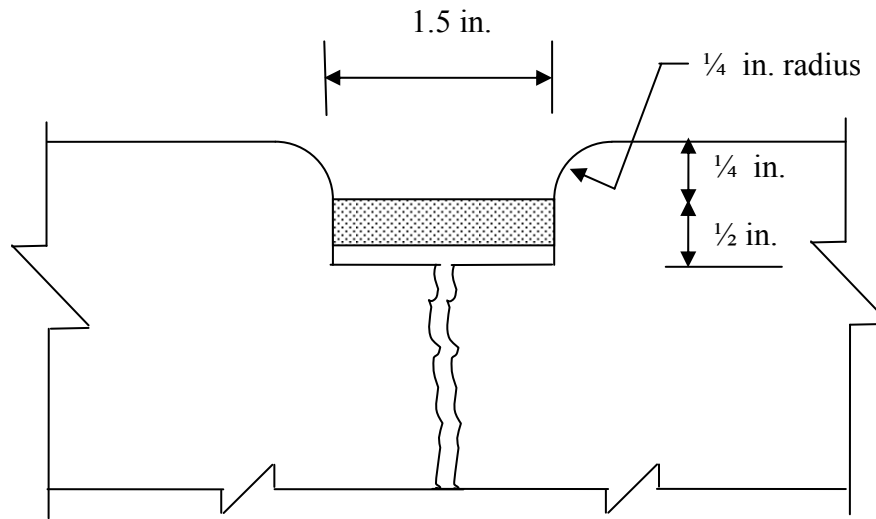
Standard construction joint for GDOT continuous deck detail
